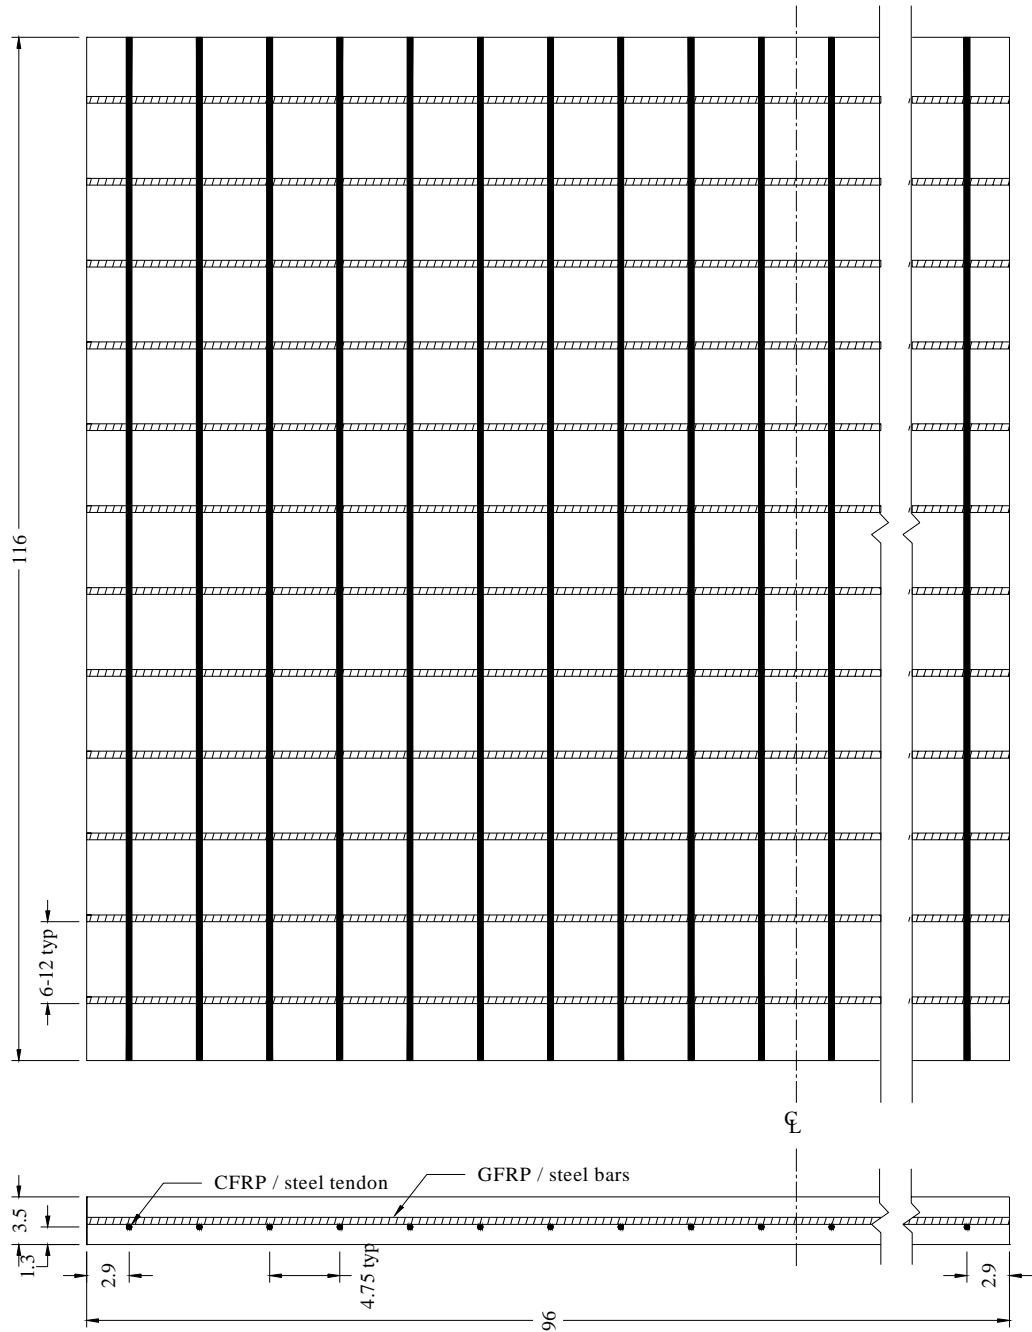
CDOT panel cross-section and plan view (all values in inches)
